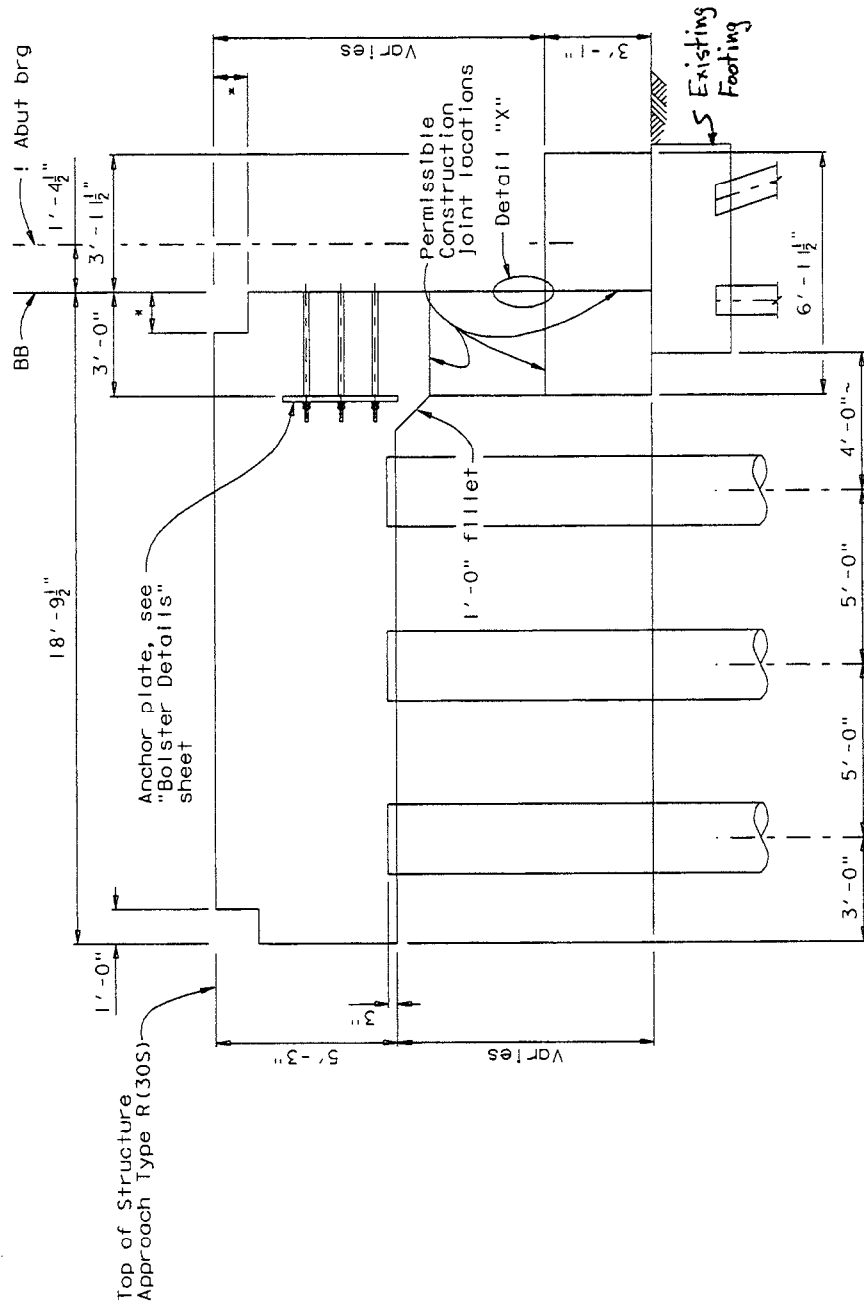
Damaged Abutment Replacement with Integral Anchor Slab Retrofit
